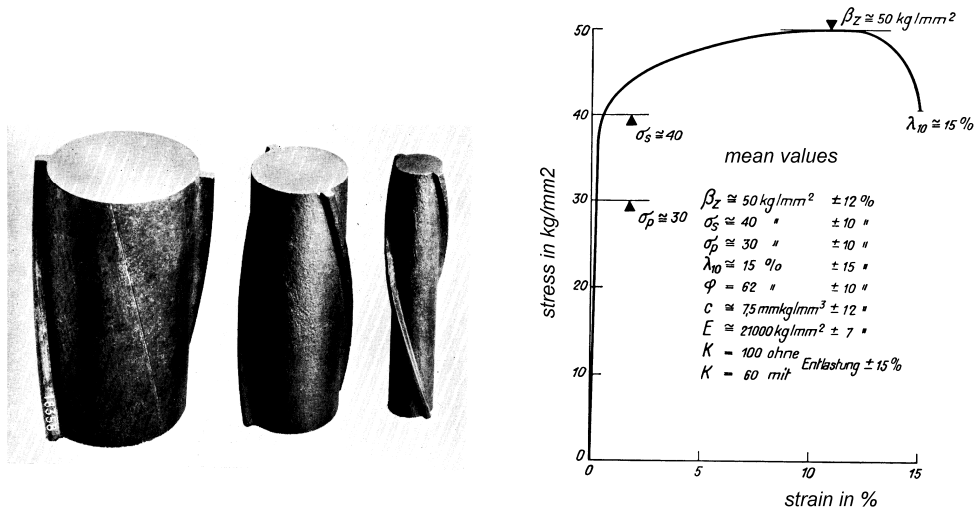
Cold formed reinforcement rebars "Tor 40" common in Swiss r.c. constructions in the 1950's [EMPA, 1950].
